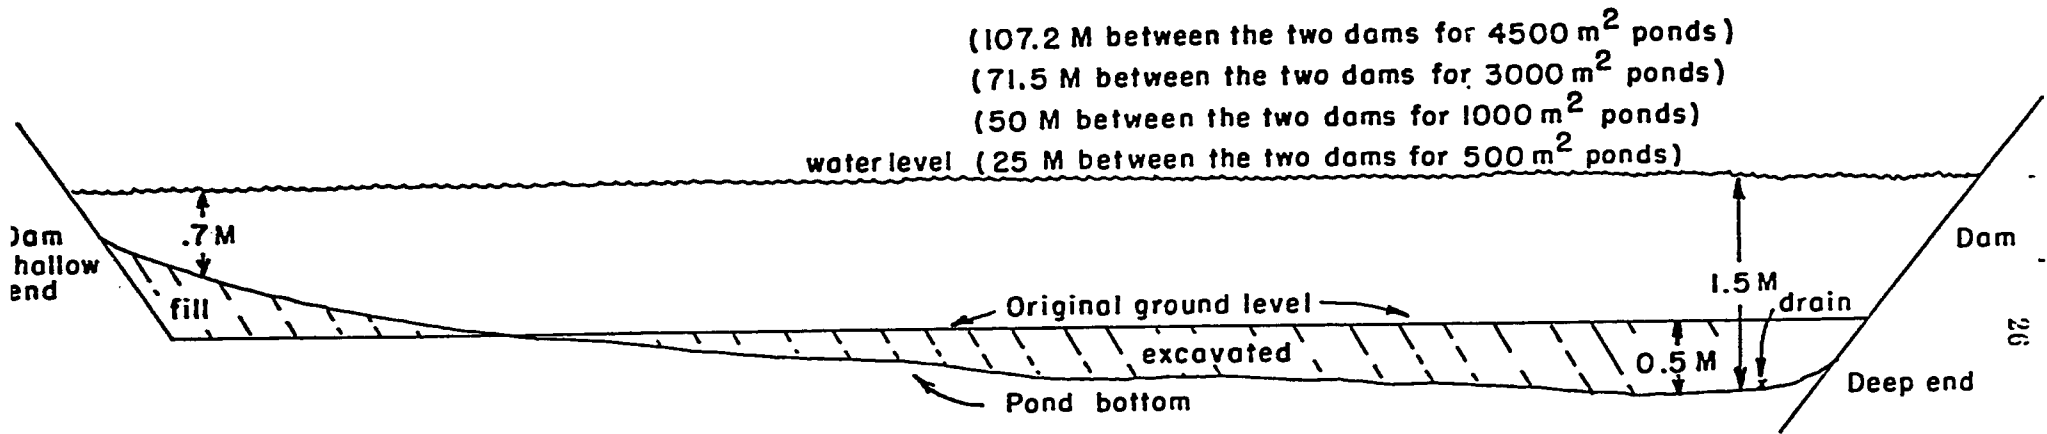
Sketch showing approximate slope of pond bottom to facilitate complete draining and excavated and fill areas.
